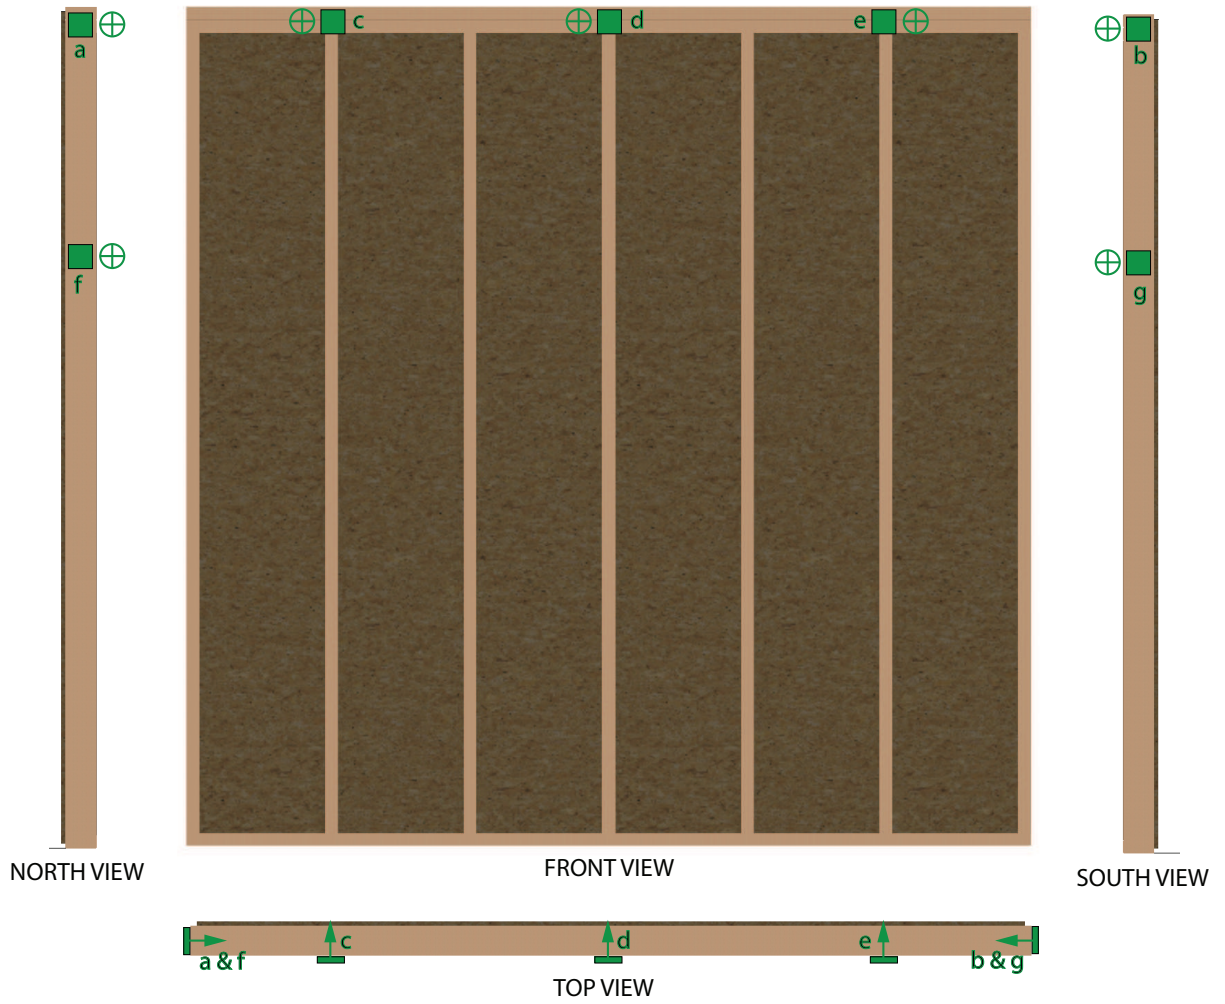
Timber wall impact locations where a cross head is used to indicate each impact location
